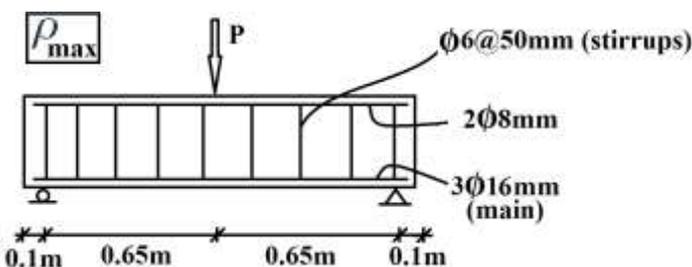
Reinforcement, geometry and loading of the beam 1P-max
